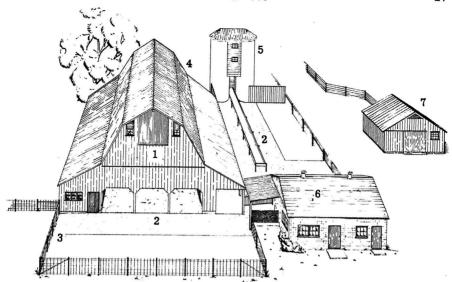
Overhead storage barn and other buildings used in housing the dairy enterprise (Mo. Plan No. 13A-723-C3). 1—Loose housing and young stock barn; 2—winter yard—60 sq. ft. of paving per cow; 3—protected fence on west, buildings on north; 4—summer yard, shade, connected to pasture; 5—silos for winter and summer feeding; 6—combination milk house and milking barn; 7—feed storage and processing building.
